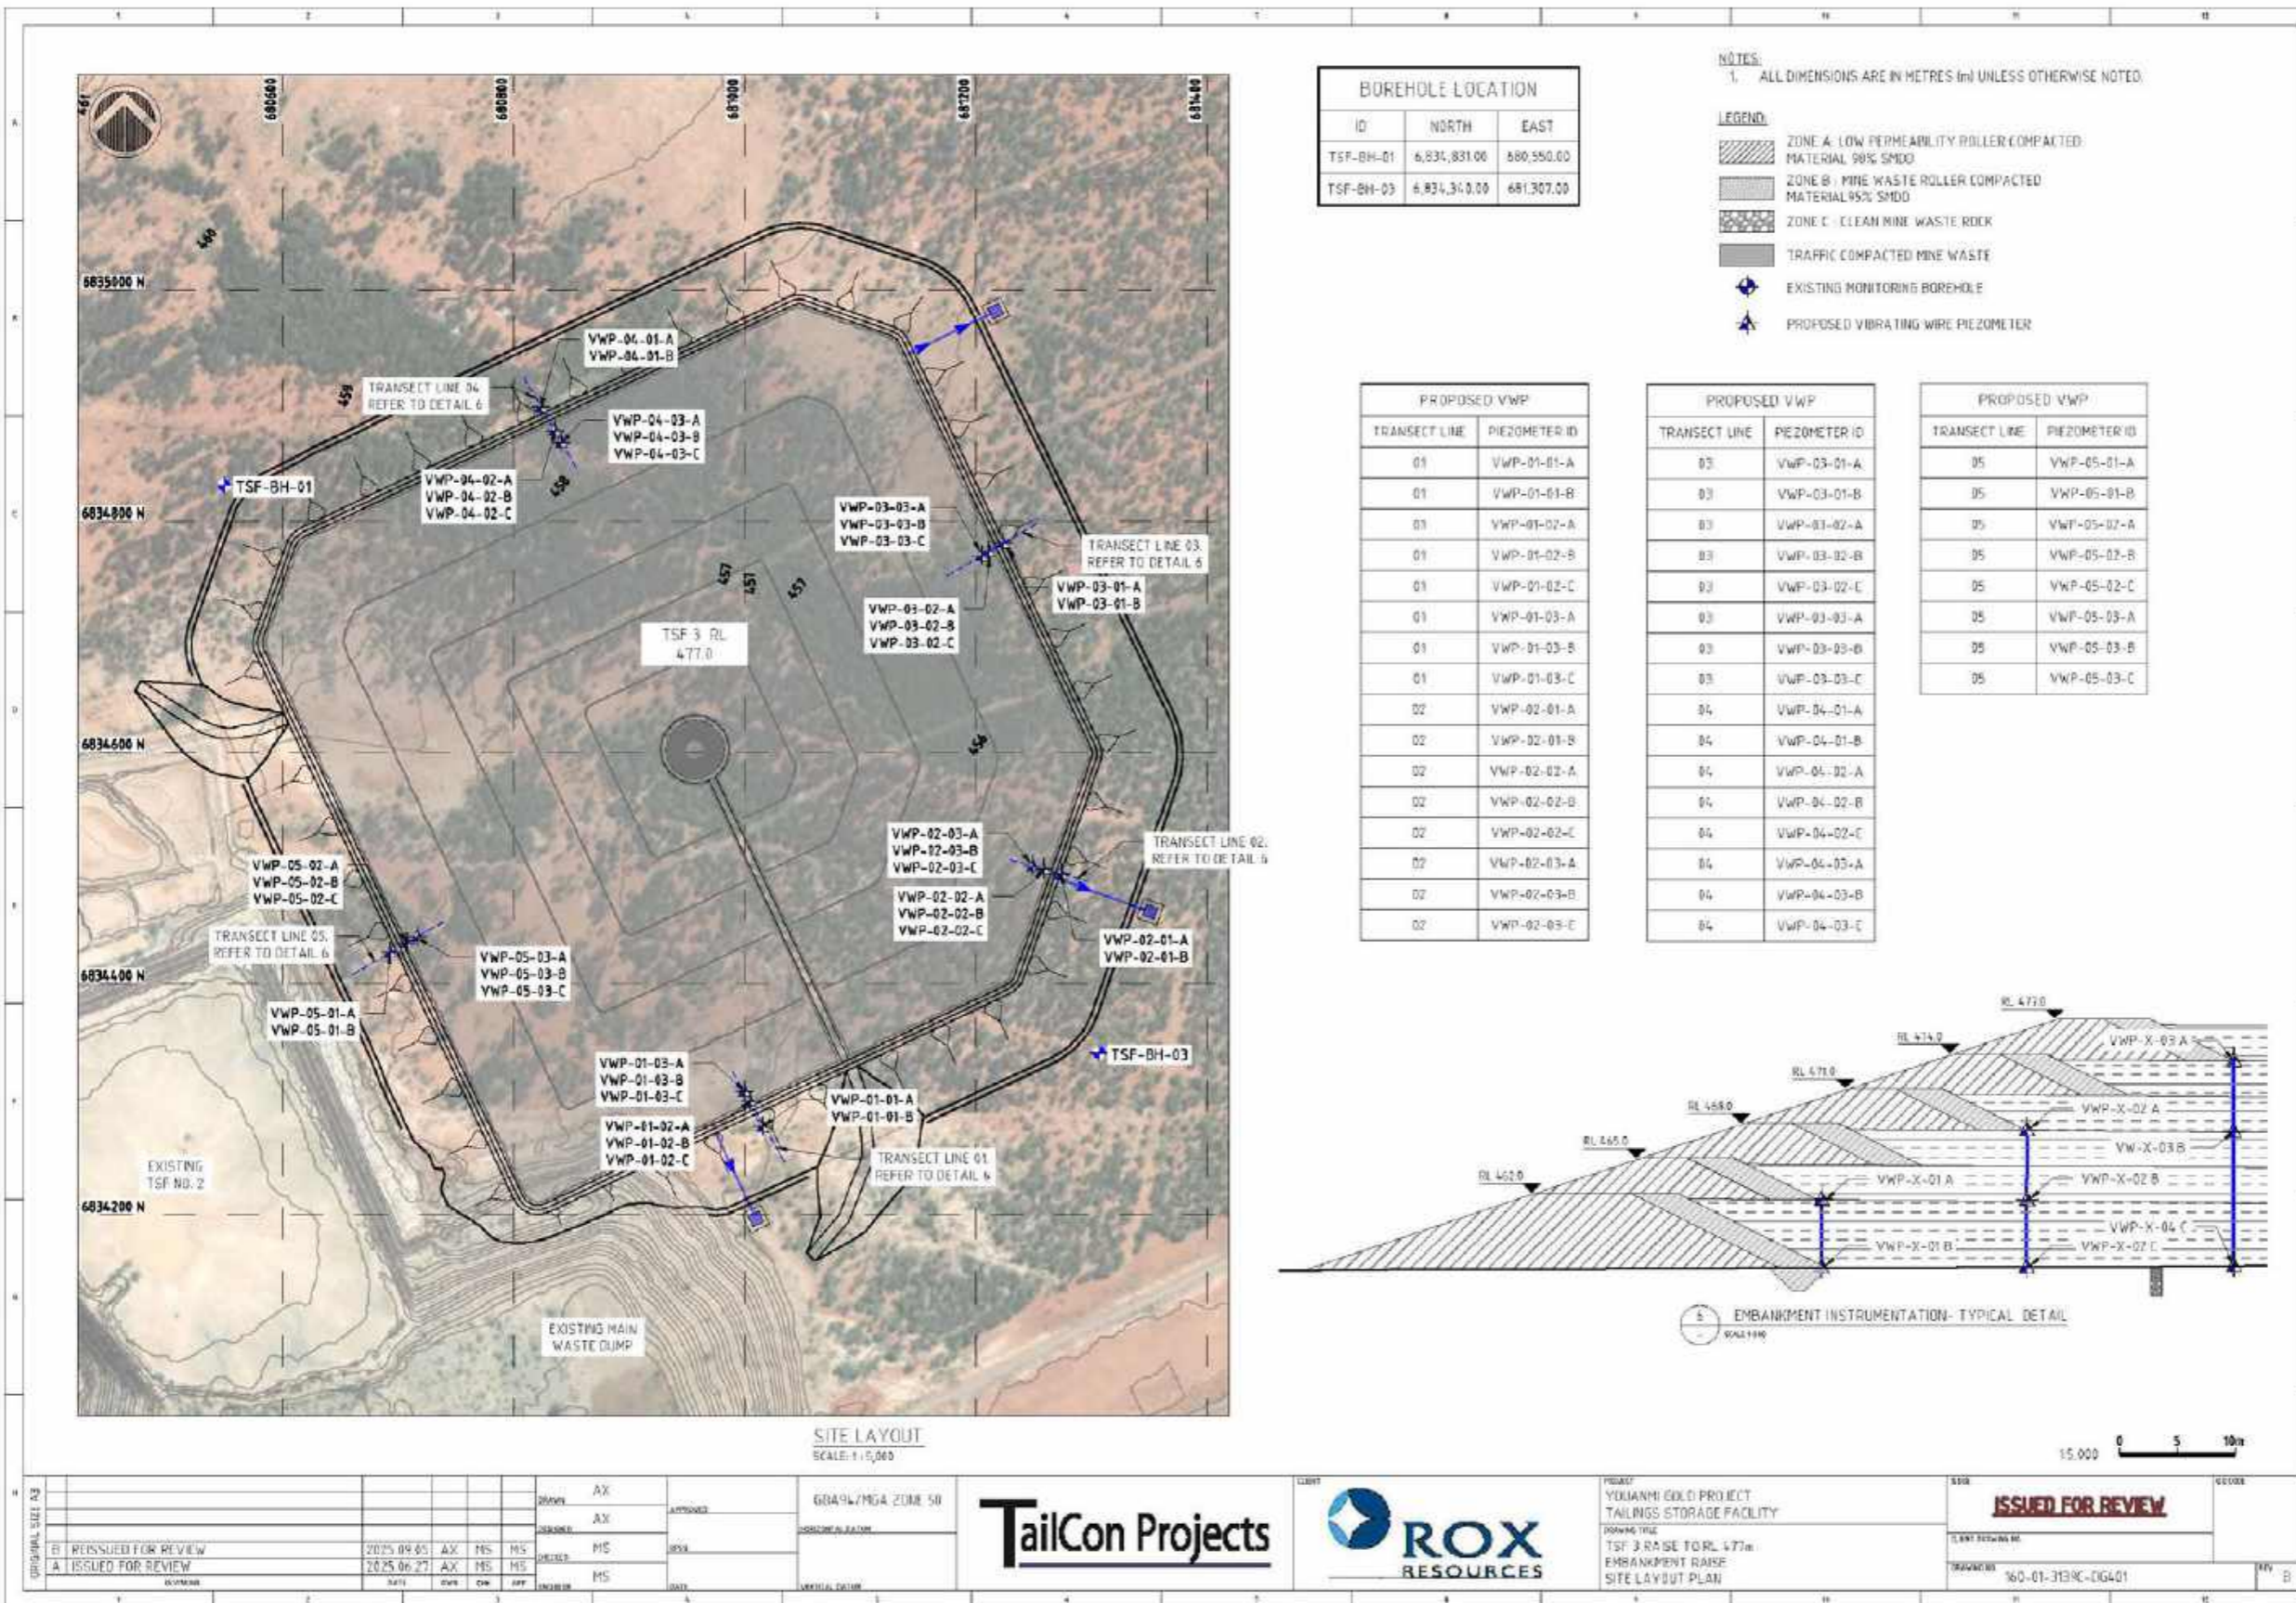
TSF3 – Monitoring Instrumentation Detail (TailCon 2025a)
